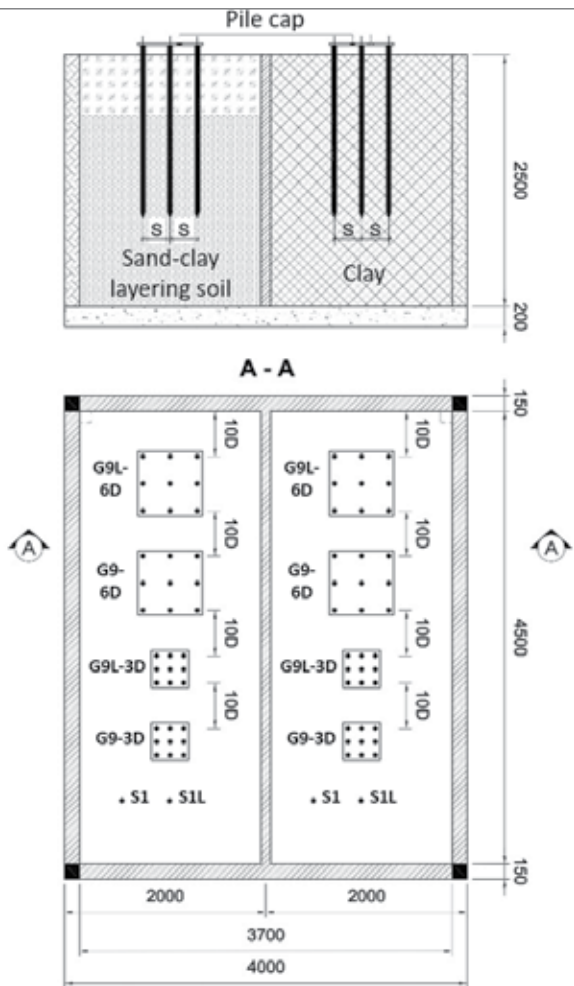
Plan and vertical section of soil tank. 6 test modes: S1- Single pile test, length pile L = 900 m; S1L - Single pile test, length pile L = 1350 mm; G9-3D - 3×3 piles group test, distance between piles S = 3D, L = 900 mm; G9L-3D - 3×3 piles group test, distance between piles S = 3D, L = 1350 mm; G9-6D - 3×3 piles group test, distance between piles S = 6D, L = 900 mm; G9L-6D - 3×3 piles group test, distance between piles S = 6D, L = 1350 mm
